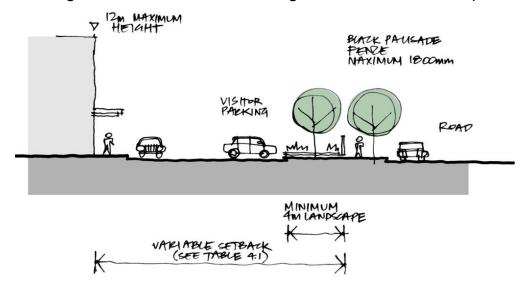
Illustration of Building Setbacks – Smaller Site (Cross Section)
